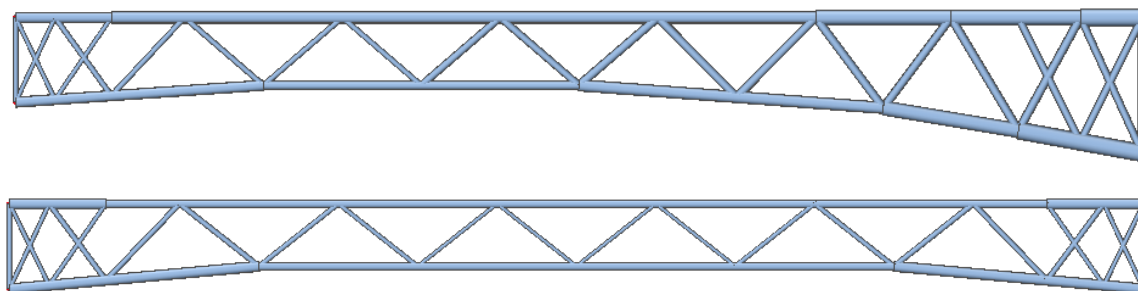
INTERMEDIATE (ABOVE) AND SIDE SPAN (BELOW) GIRDER LAYOUT
